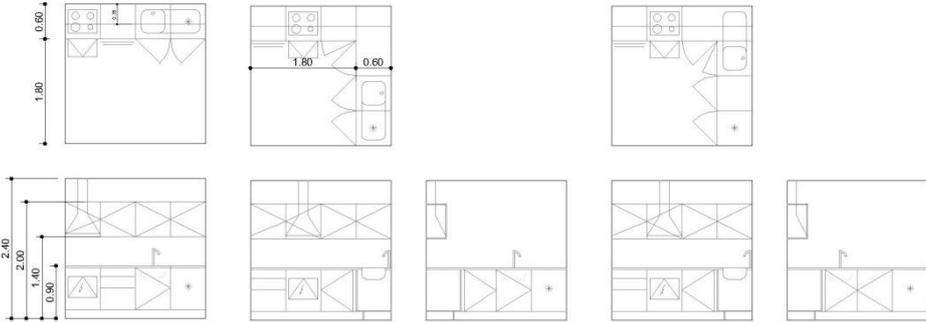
kitchen layout study for a 2,4m³ module. Plan at the top; Elevation at the bottom
